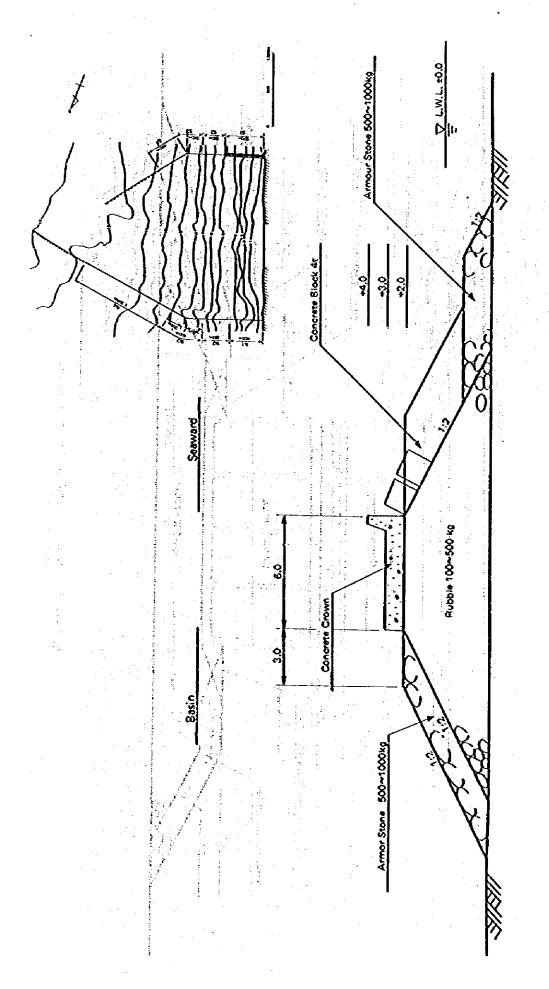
(6) Standard Crosssection of Breakwater (\$1 Section)
